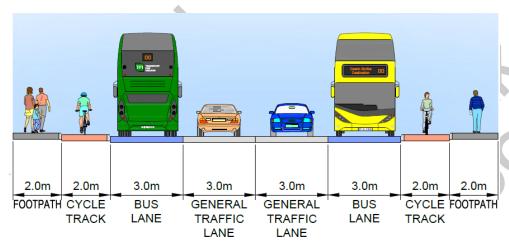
Section 1, Proposed Option 1 - Cross Section A-A
